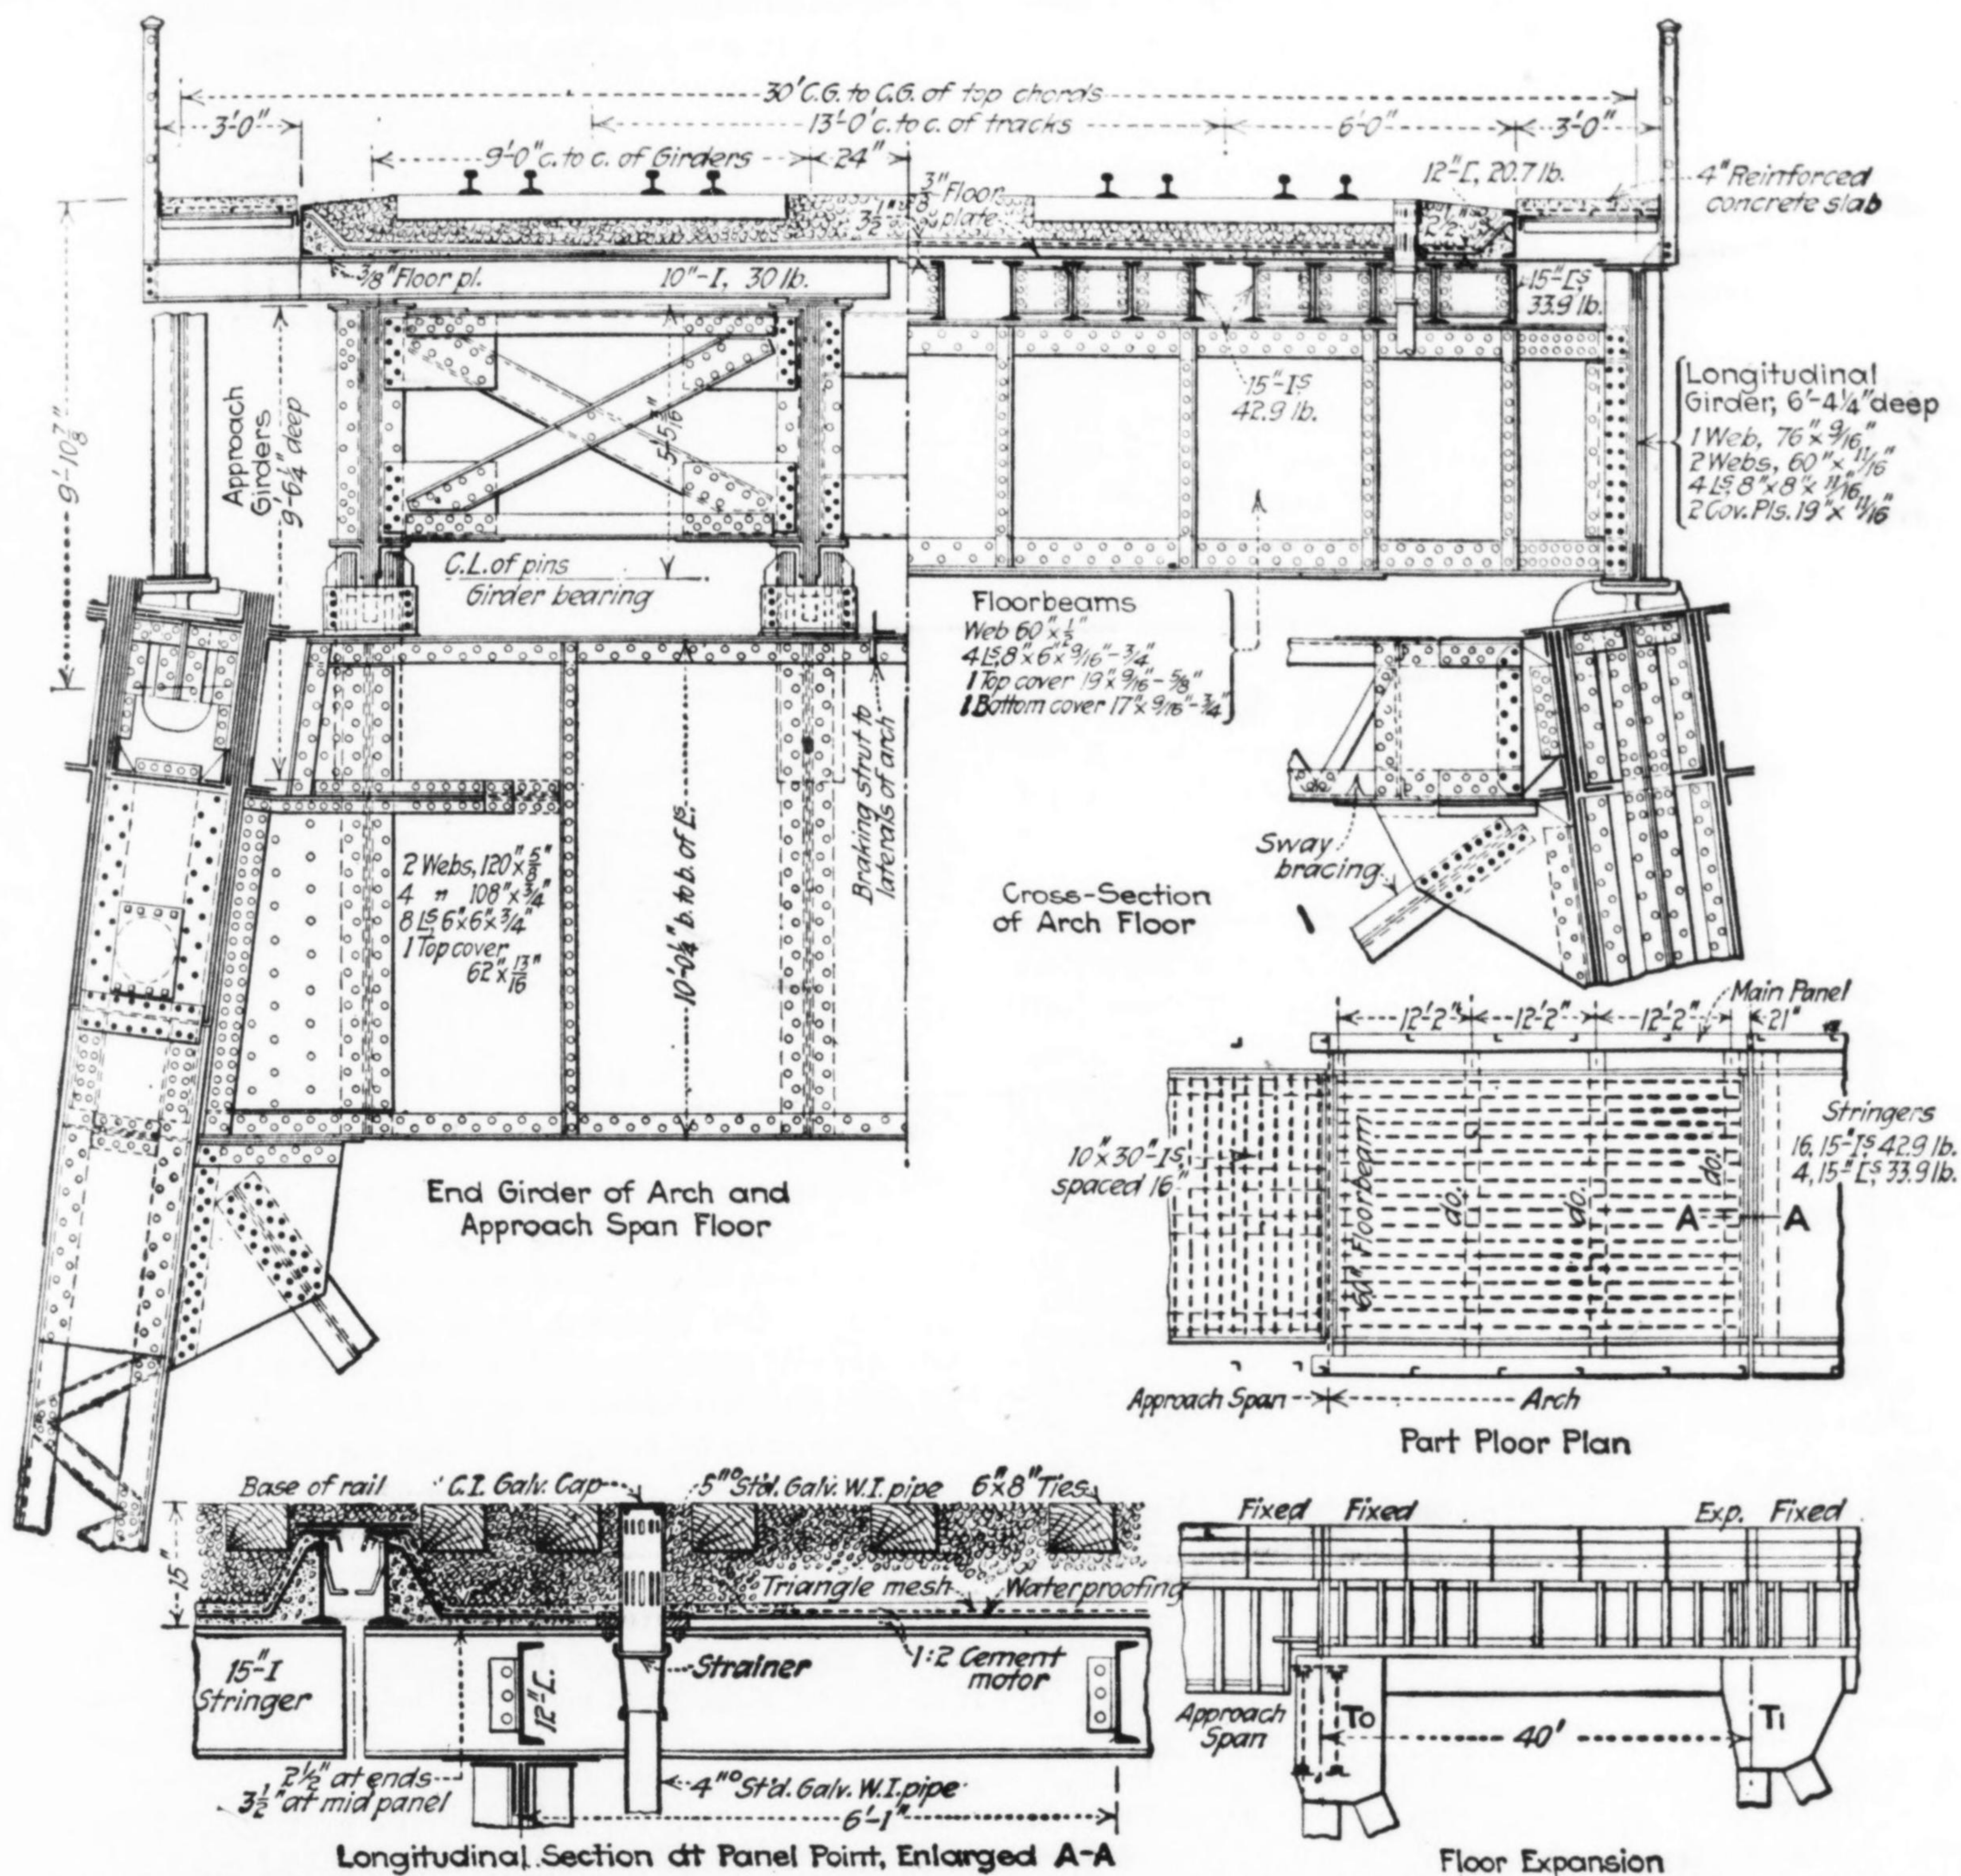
SUB-PANELED FLOOR CONSTRUCTION WITH BALLASTED DECK, RESTING ON TOP CHORD OF ARCH
